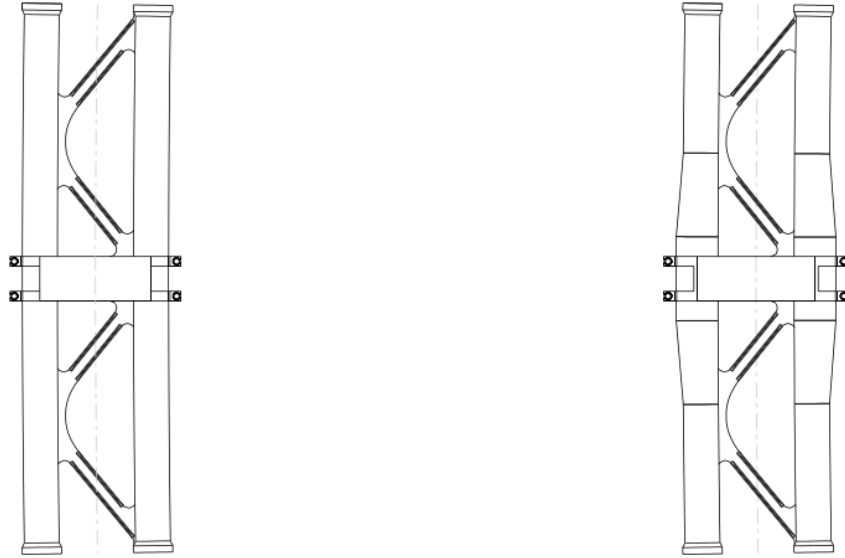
Alternating cross tube connections without lay-bys (left) and with lay-bys (right). The sections shown are 197m in length and include the horizontal bracing system.
